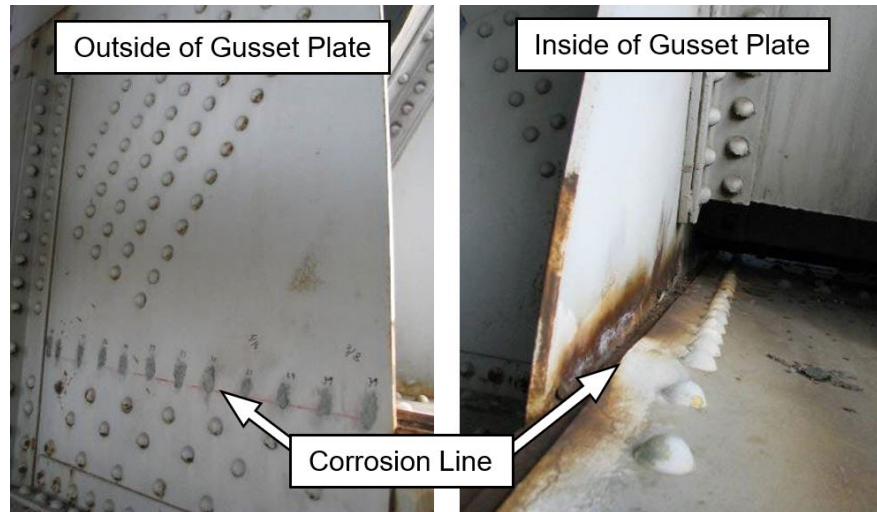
Corrosion Line Viewed from Inside and Outside of Gusset Plate
